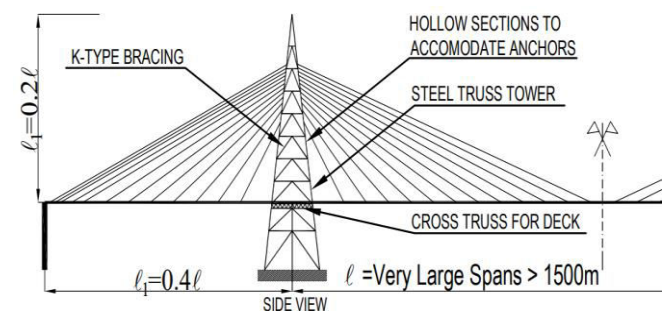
Close view of Cable Stayed Bridge with Steel Trussed Pylon
